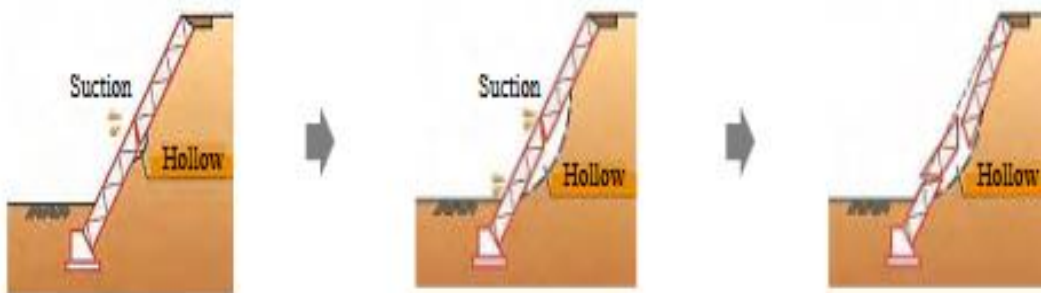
Damage of slope protection work caused by suction of backfill material
